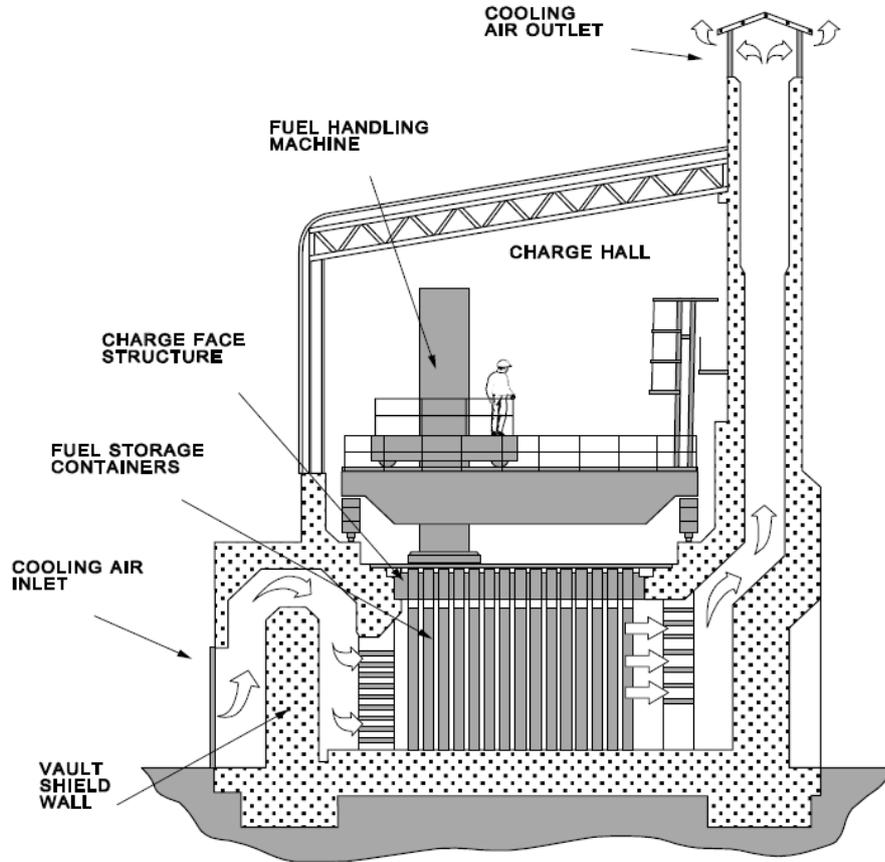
Schematic view of a modular vault dry storage (MVDS)
